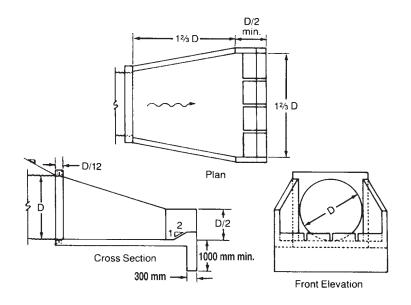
Treatment of outlet end of large corrugated steel structures.
